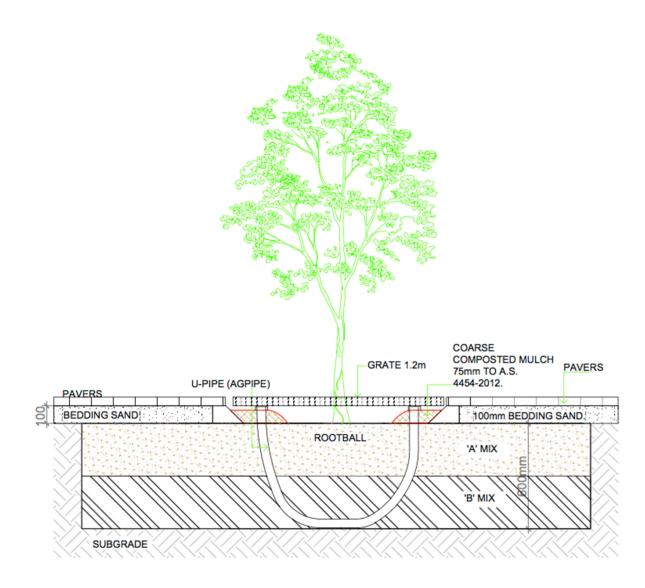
Typical cross section: Restricted space poor drainage option (3 layers). Refer to Council's standard drawings for design details.
